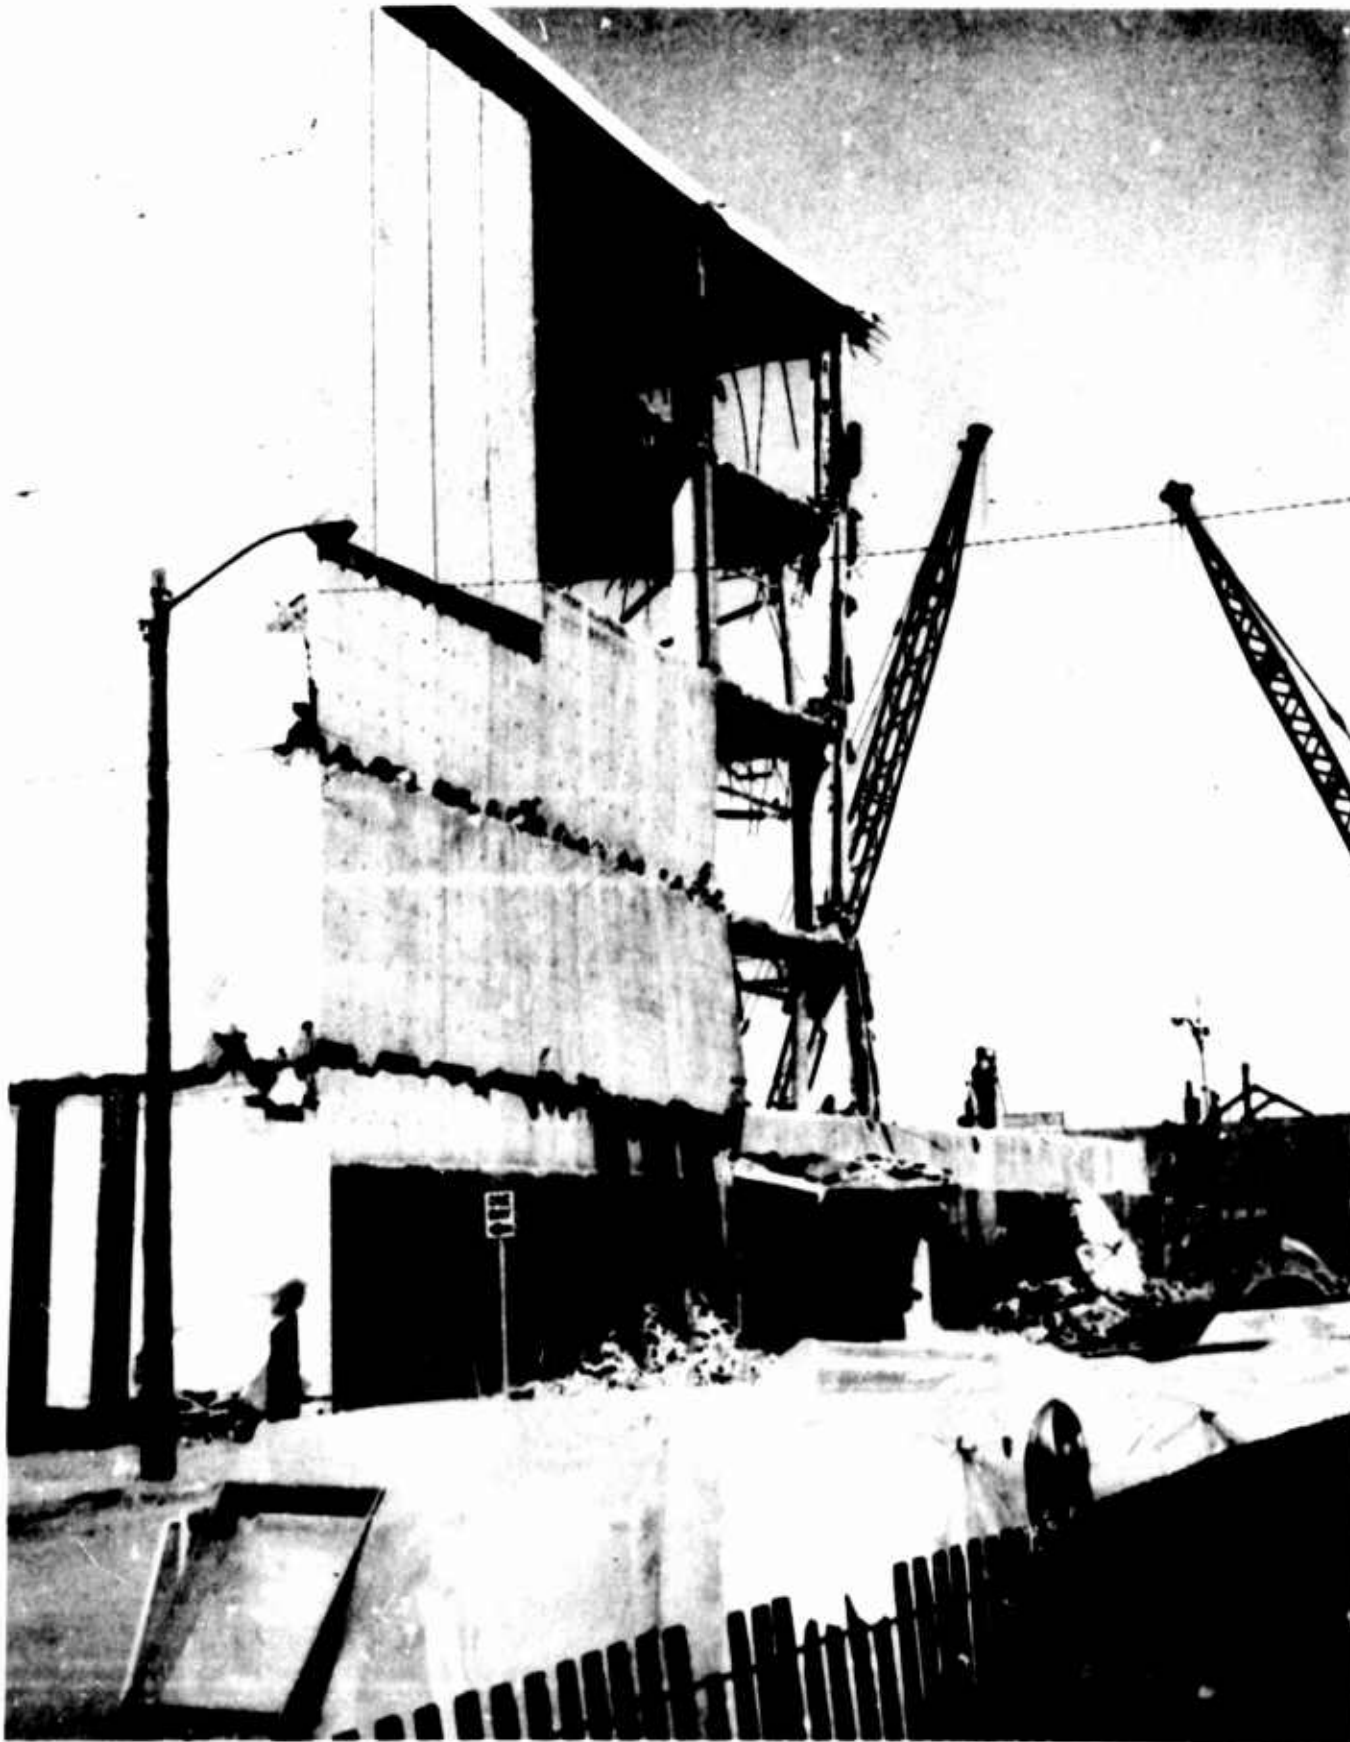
J. C. Penney Building (East side of the structure during demolition showing unseated shear panels, floor slab failures, and intact first-story walls)
